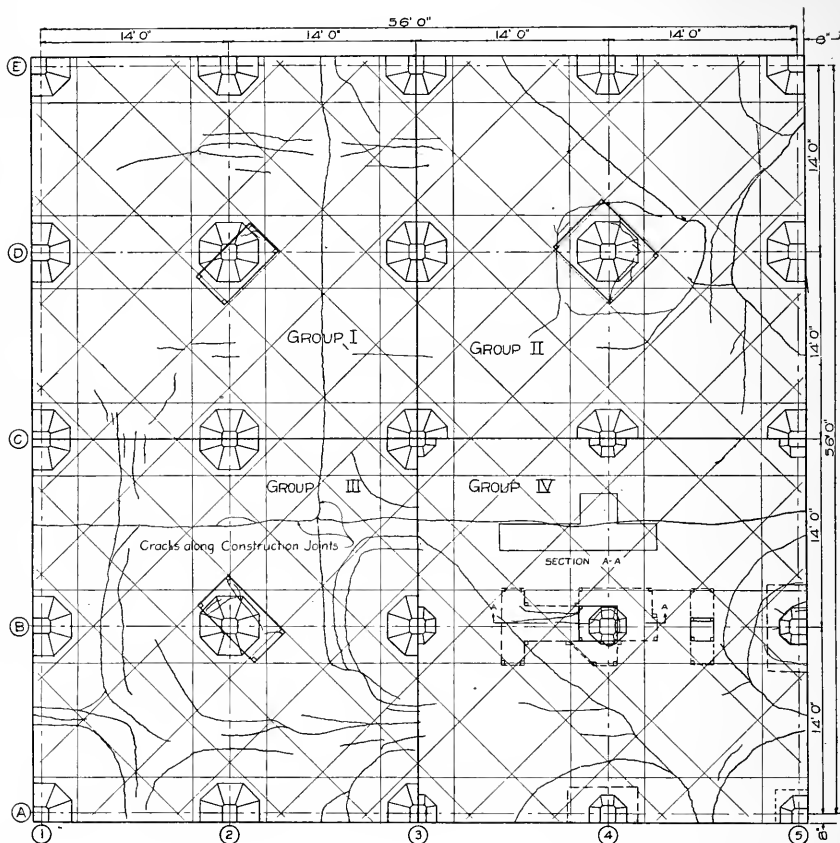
CRACKS FOUND ON UNDER AND UPPER SURFACES OF WORCESTER TEST FLOOR AT MAXIMUM LOAD.
